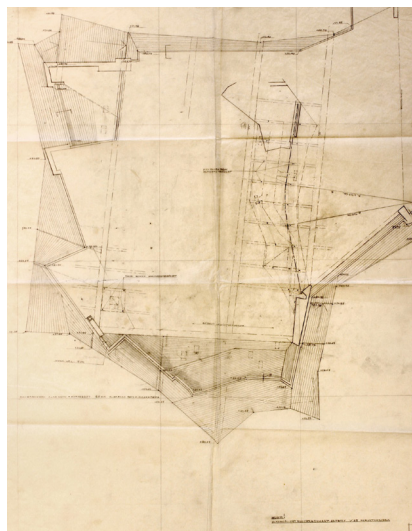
Plan of the wooden roofs of the eaves of the organic sector. Suomen rakennustaiteen museo - Museum of Finnish Architecture - MFA
